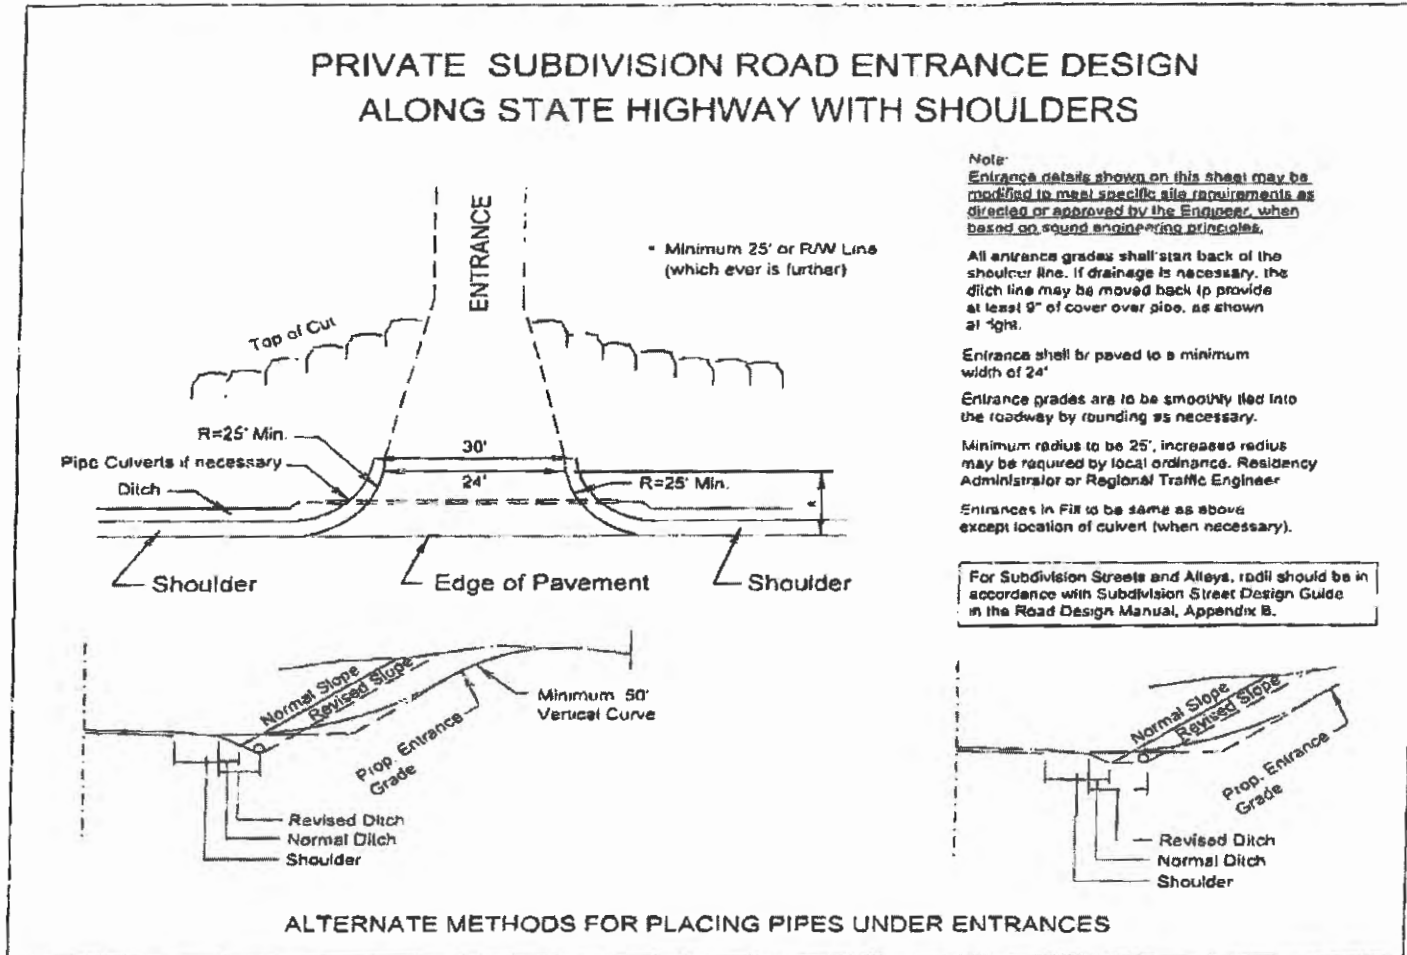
COMMERCIAL ENTRANCE DESIGN TO SERVE A PRIVATE SUBDIVISION ROAD / STREET
